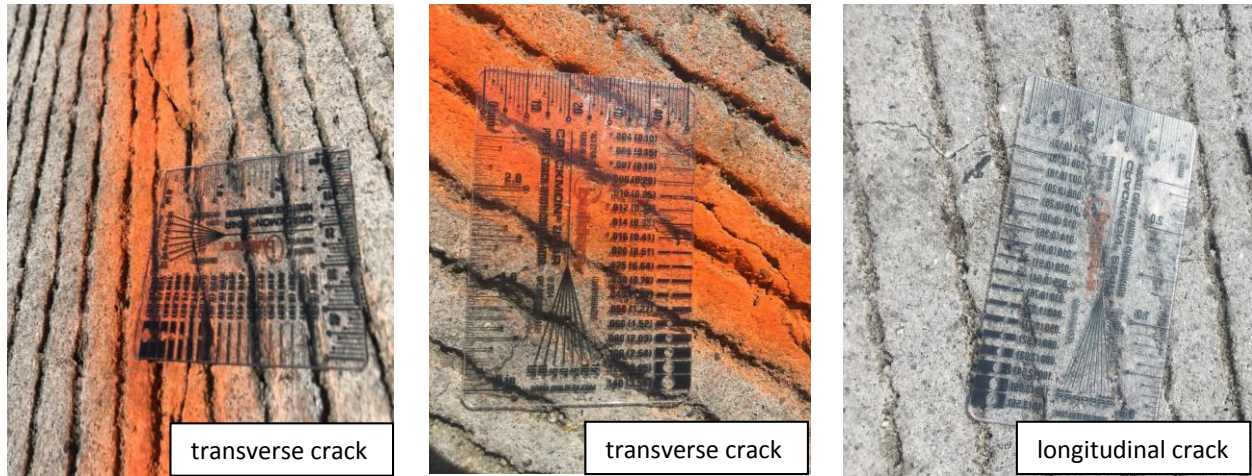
The Measurement of Typical Crack Widths at S6-a and S6-b
